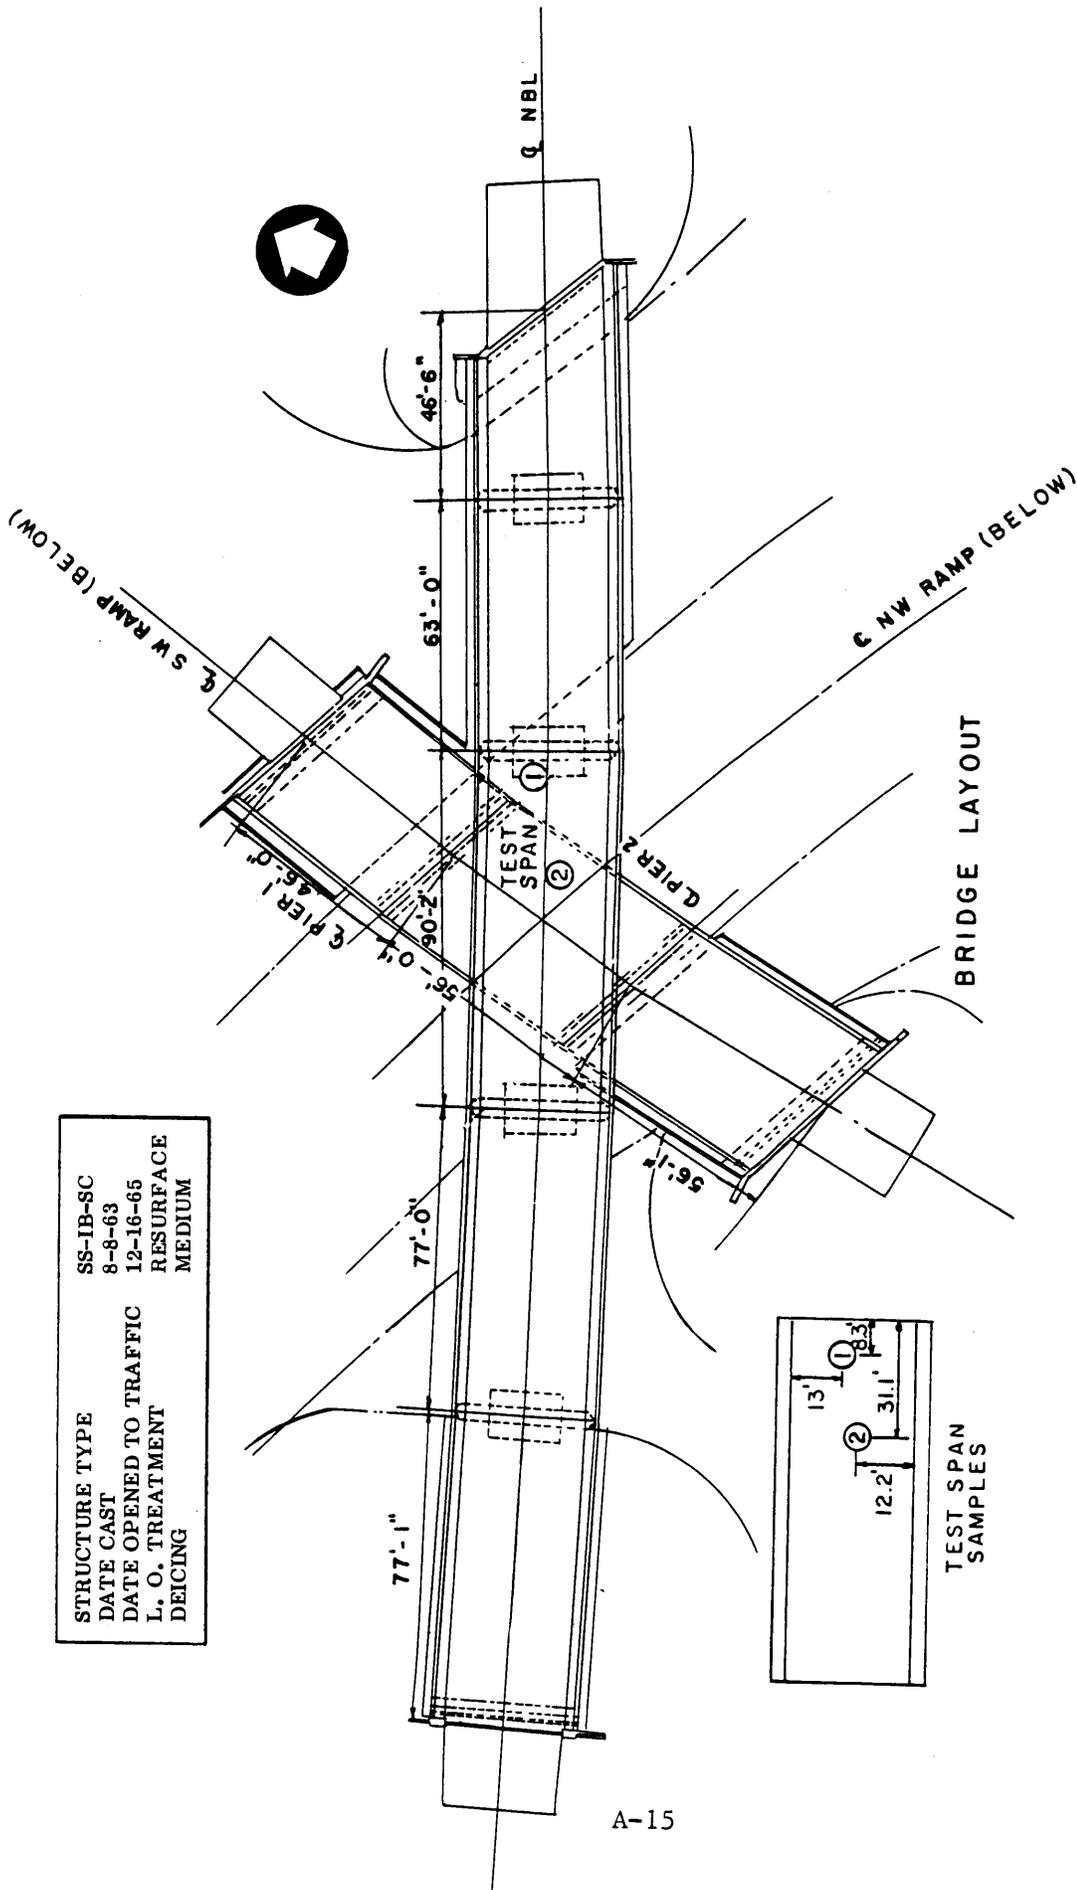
Plan for bridge #13; also shown are the locations of test samples.
